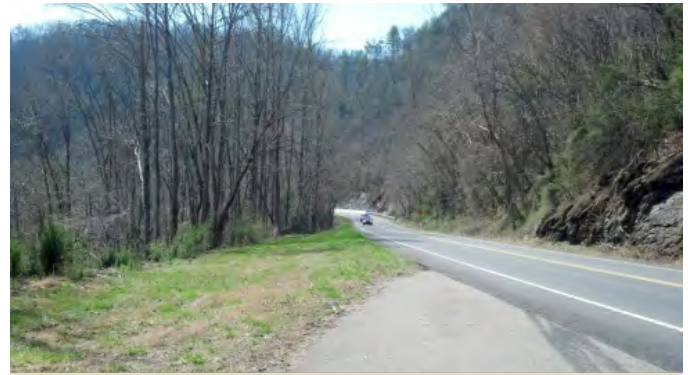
Typical corridor conditions throughout Walland Gap area; note the steep terrain on right (south)
